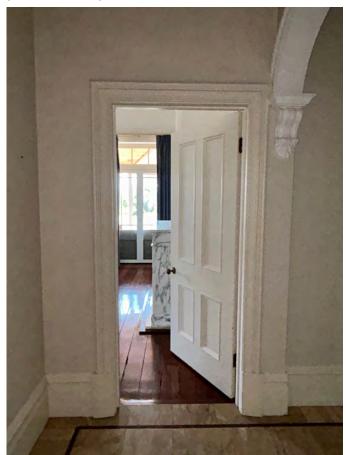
View east from within corridor towards north-east Sitting Room, capturing corridor archway (c.1927 plasterwork) and timber skirting.(Source: PA 2023)
